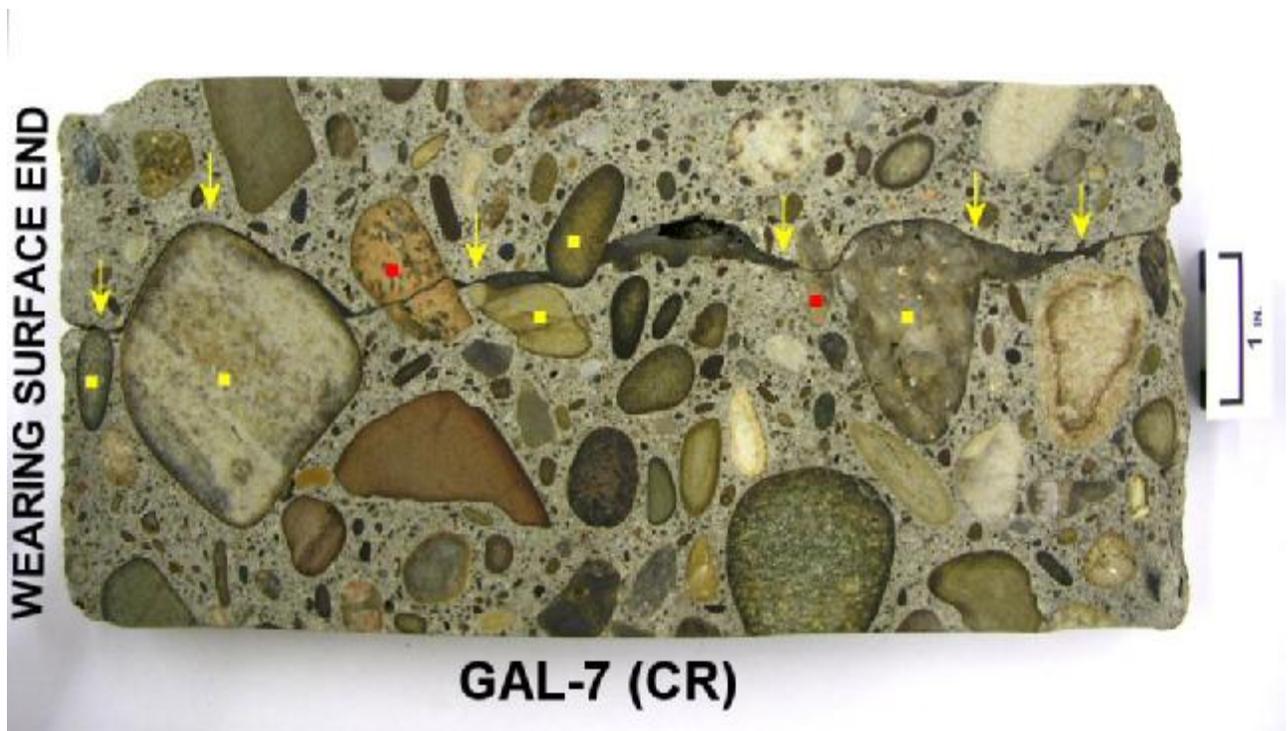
Lapped surface of Core GAL-7 (CR) showing the full depth (8 in.) mid-slab crack.
